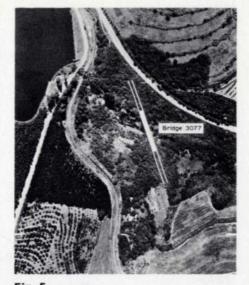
Bridge 3077 Aerial photograph of bridge site (Photo: Courtesy of Map Studio Productions (PTY) Ltd.)
